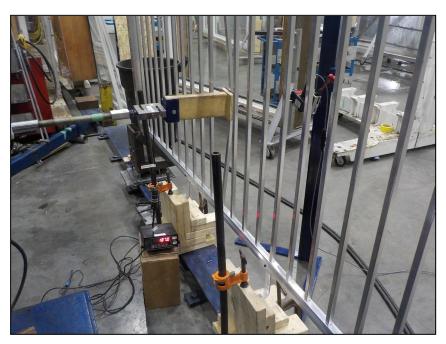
Century Welded Fascia: In-fill Load Test
